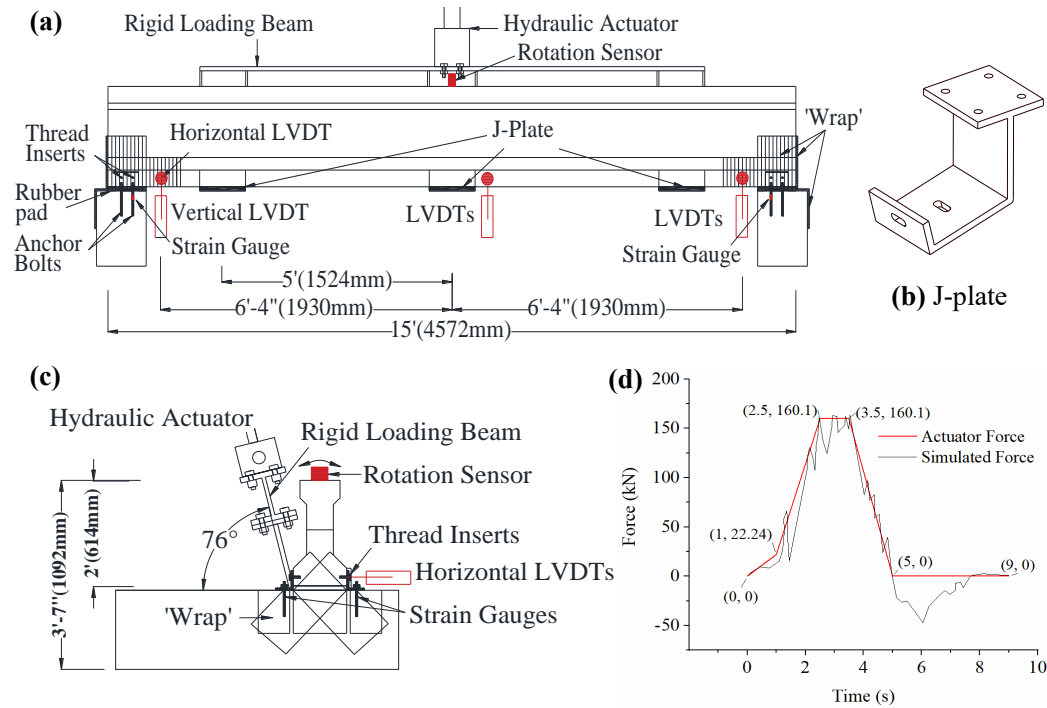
Laboratory test set-up, showing (a) actuator force applied to the test girder via rigid steel beam connected to the girder at three points; (b) profile view of the actuator loading angle; (c) J-plate; and (d) Modified (lab-scale) Hurricane Katrina wave forcing function produced by the actuator (red) that models the desired theoretical wave load according to the modified Douglass function [5,31]
